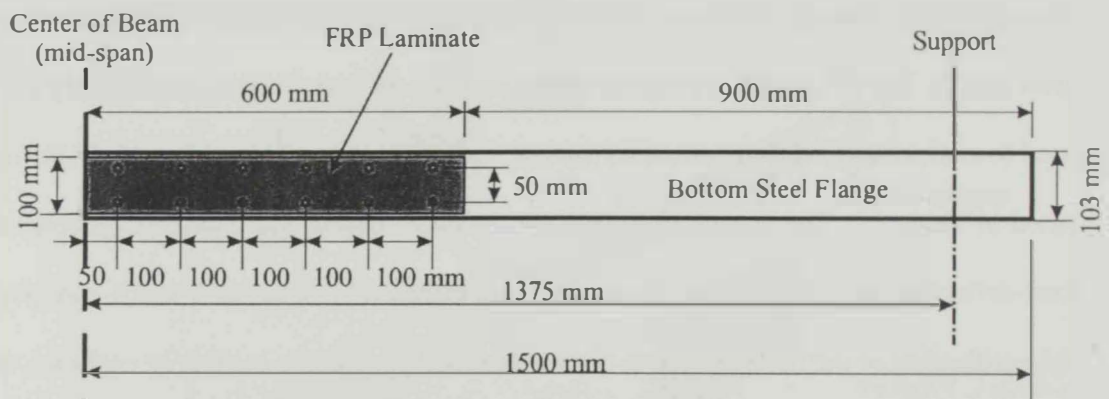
Sample Bottom View of 1200S Beam Showing the Typical Fasteners' Pitch and Edge Distance
